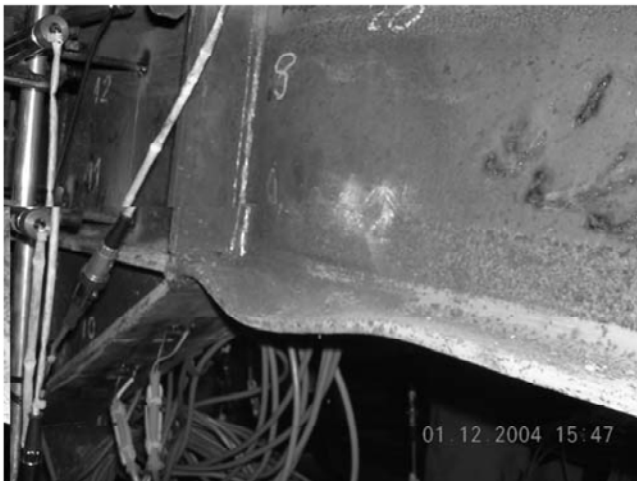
Buckling of beam web and beam bottom flange: haunch specimens
